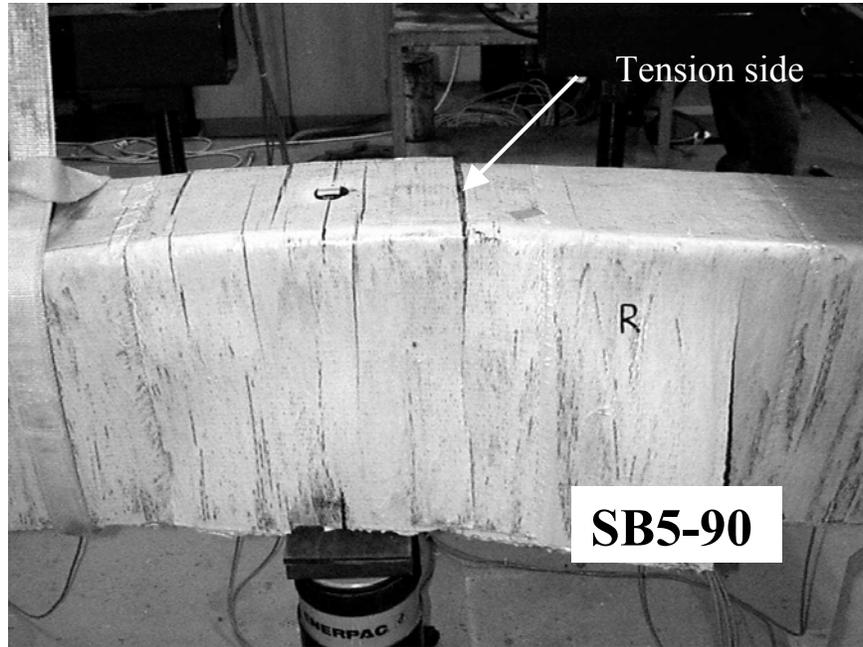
Failure Pattern of the Beam Bonded with CFRP Fabric inclined at 90°; Rupture and Delamination of CFRP Fabric
